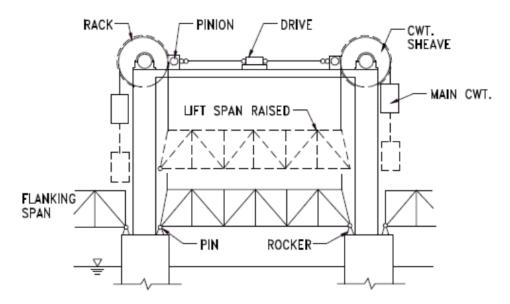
Connected tower drive vertical lift bridge (Berger et al., 2015b)
